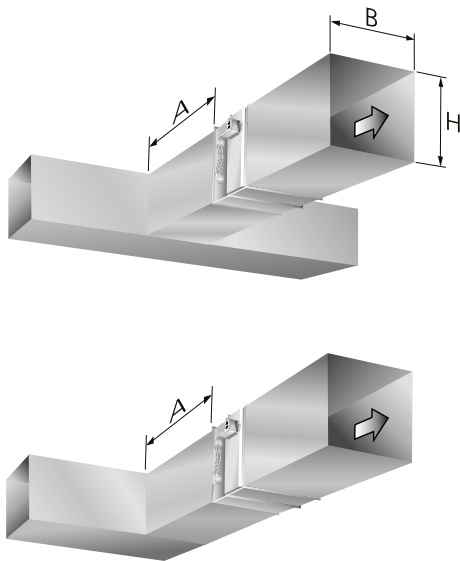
Requirement for lengths of straight duct in a rectangular design ahead of the unit,  $A > 2 \times B$ .
